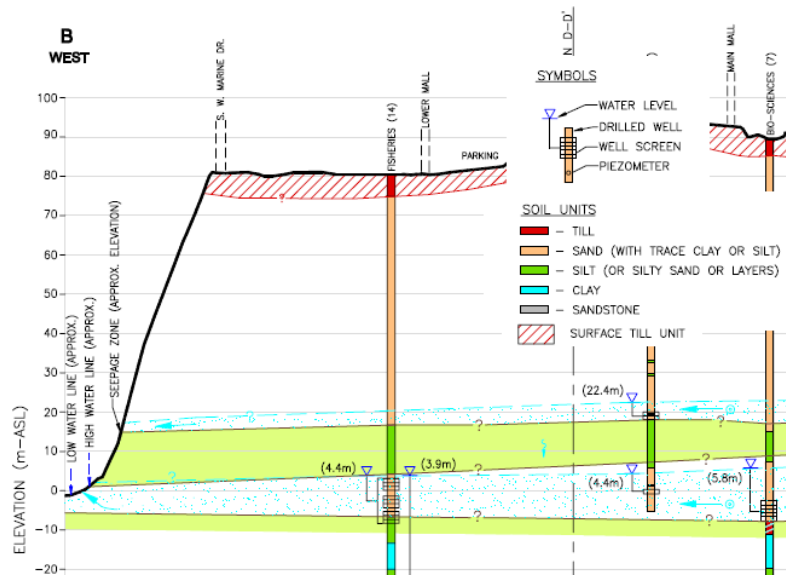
Geotechnical Cross section B-B' (Piteau Associates Engineering Ltd., 2012)
